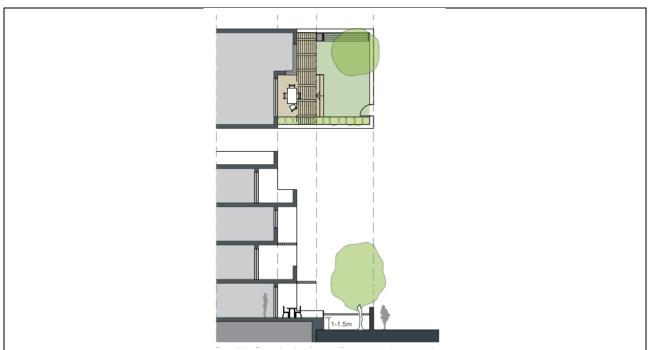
L.4 titled: Plan and section of a ground floor apartment with an elevated terrace and a level private courtyard.
